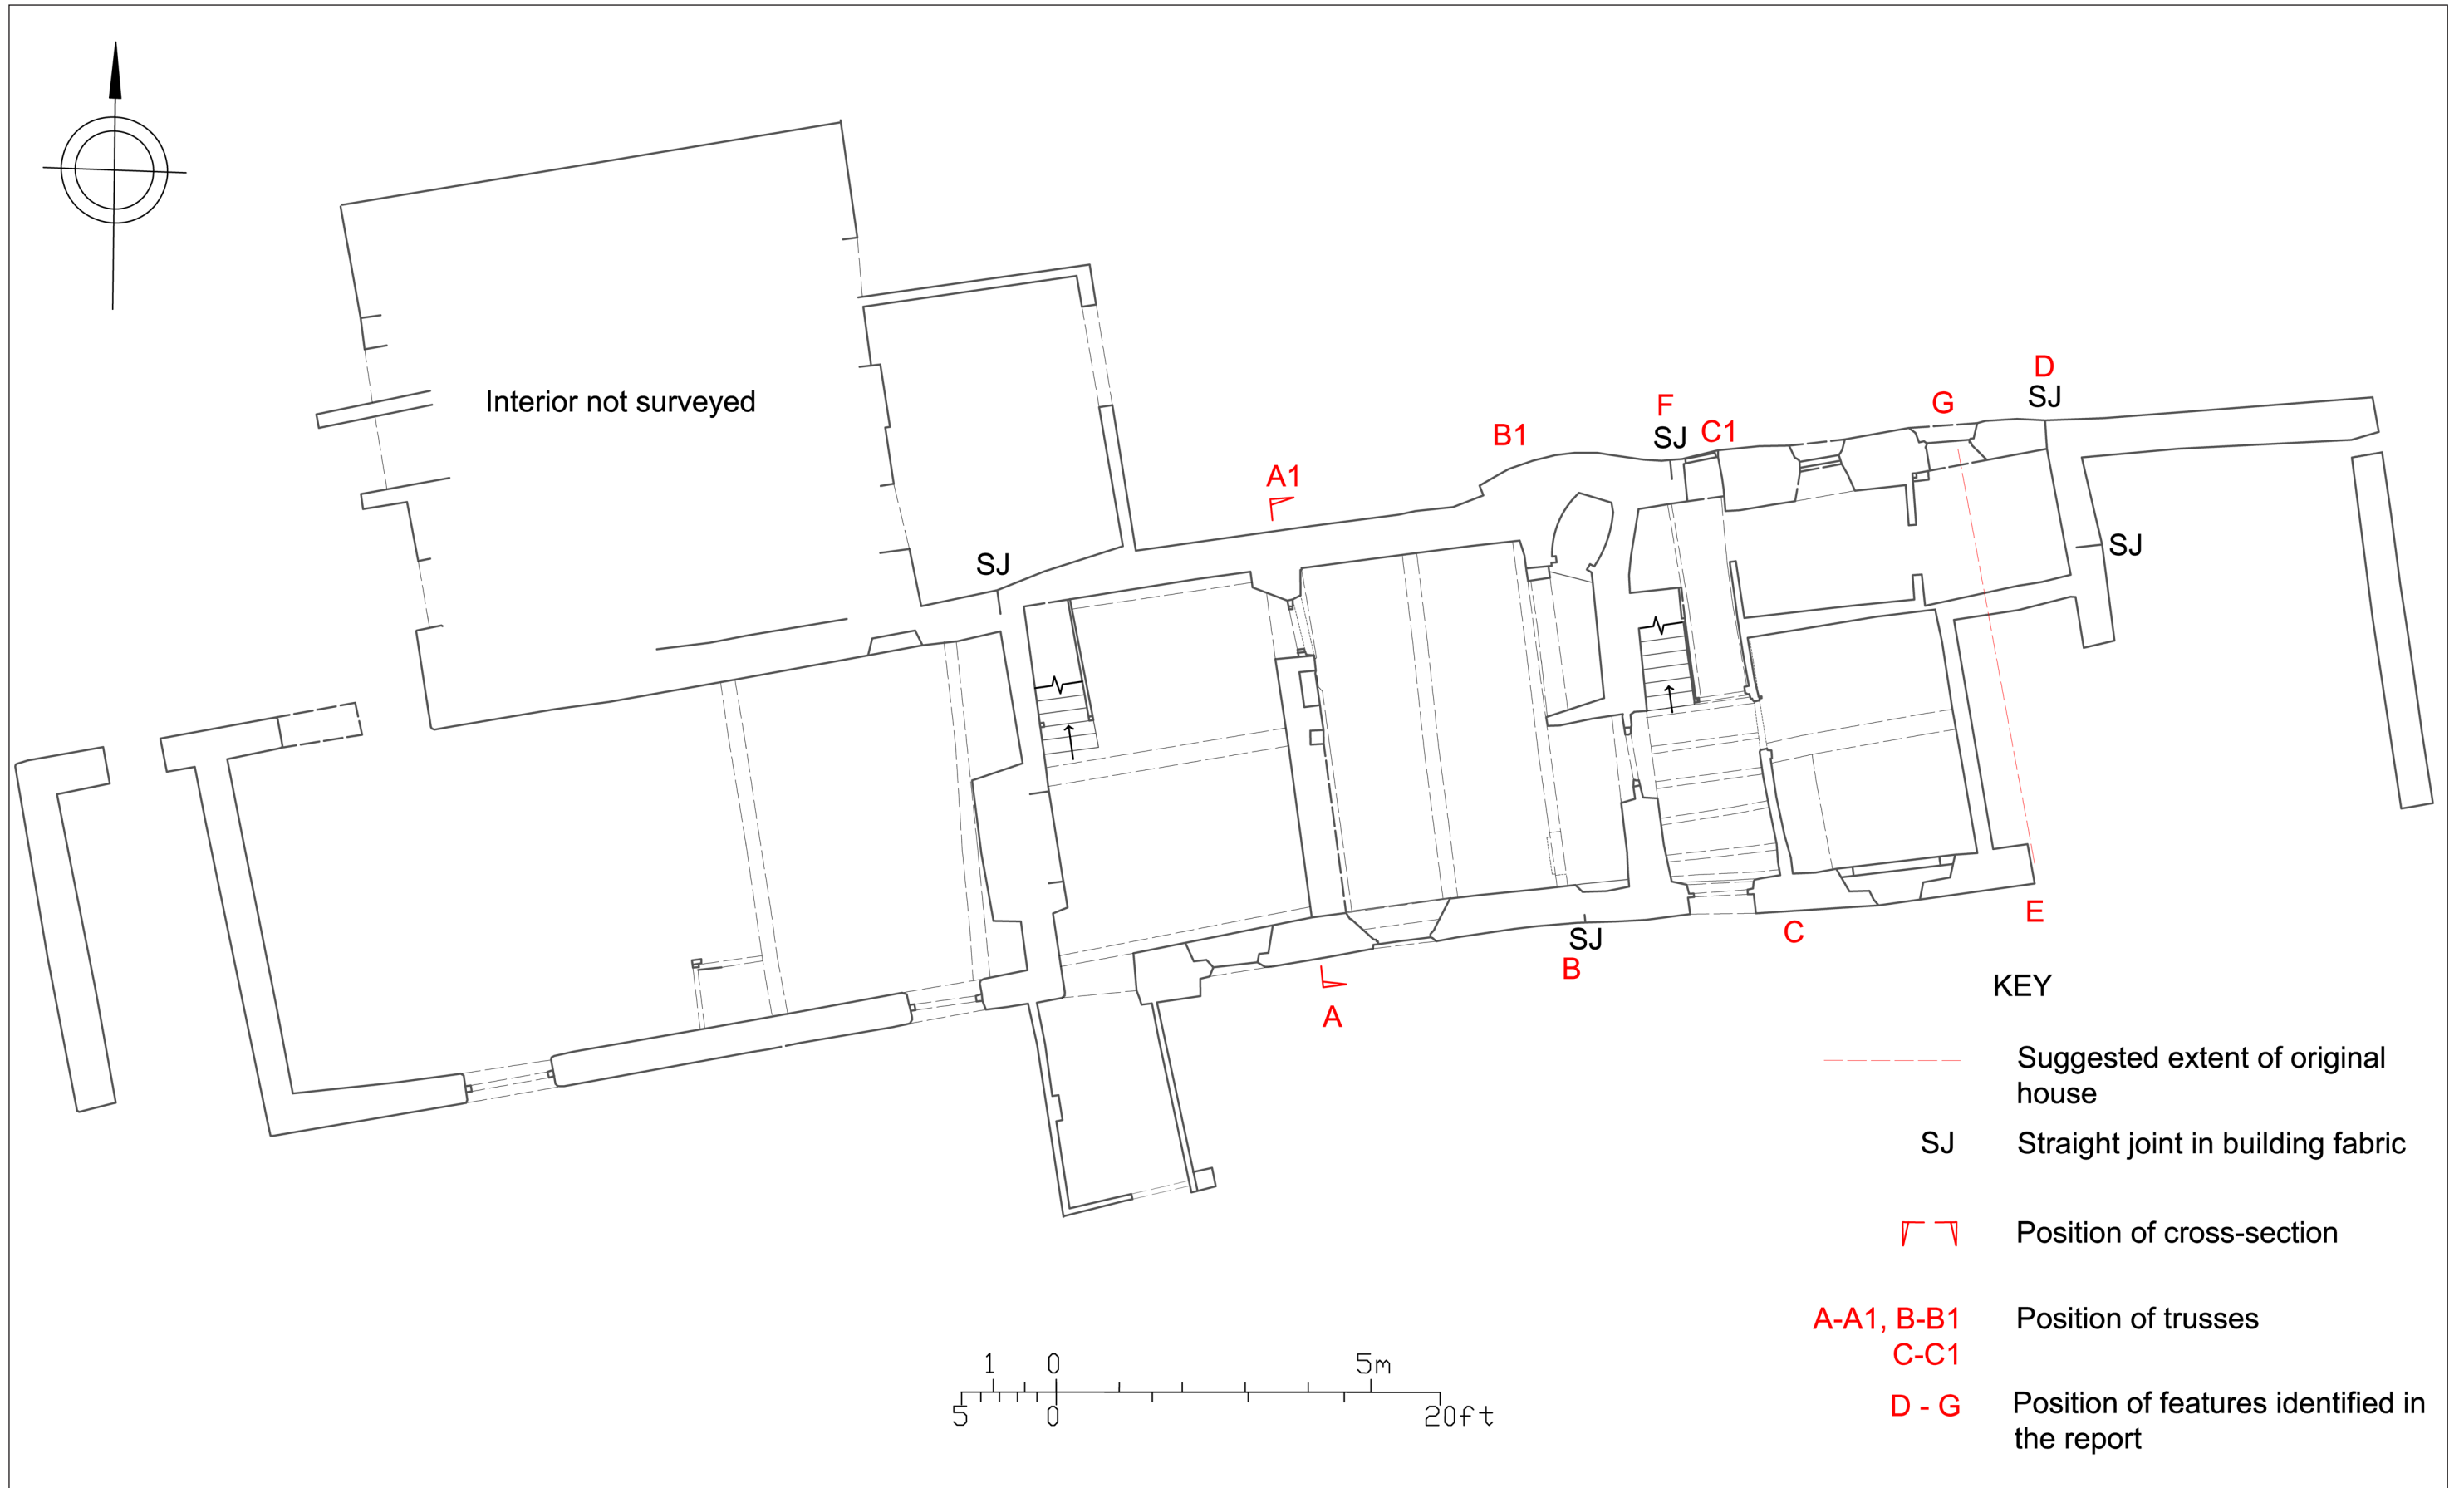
Ground-floor plan showing positions of trusses and other features. Scale 1:100 [© Historic England]
